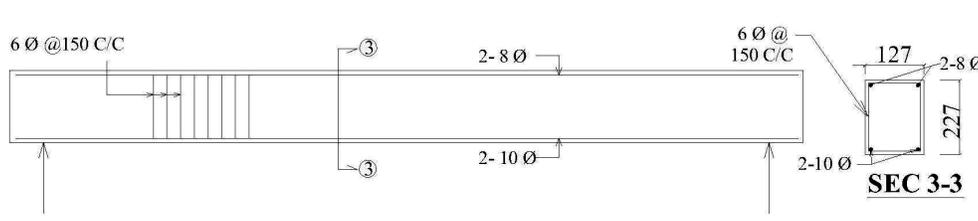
Longitudinal and Cross-Section of Unretrofitted Under Reinforced Beams
